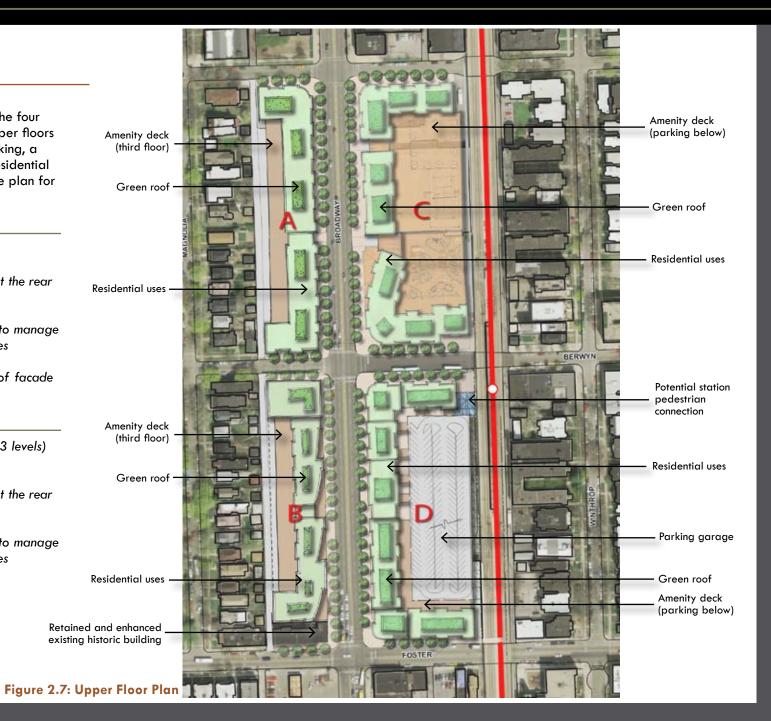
shows the generalized upper floor plan for the four blocks adjacent to the Berwyn Red Line station. The upper floors of the buildings are proposed to include structured parking, a nominal amount of office and commercial space, and residential units. The following briefly describes key elements of the plan for each block.
